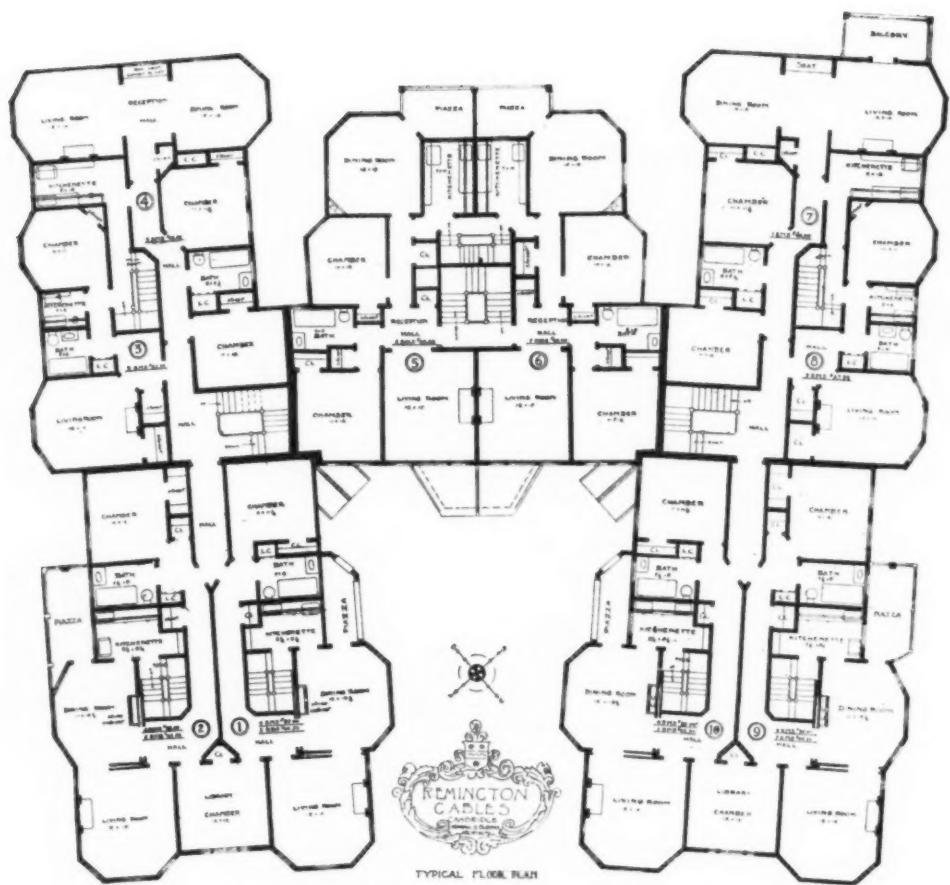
TYPICAL FLOOR PLAN, REMINGTON GABLES, CAMBRIDGE, MASS.
